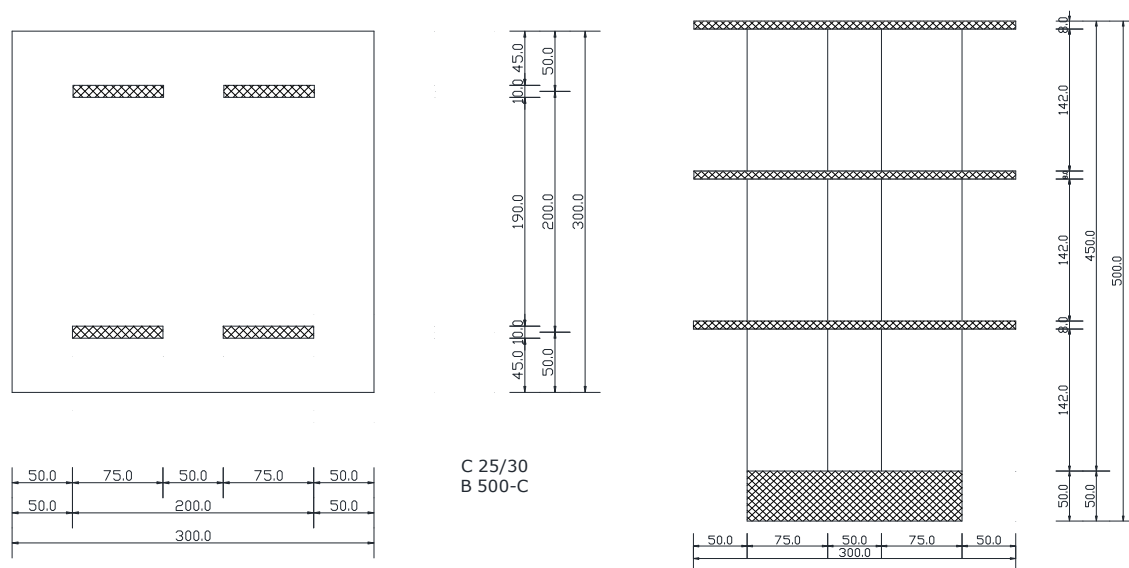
Geometry of the specimen with coupling beams - Typical floor plan (left), Typical cross-section (right)
